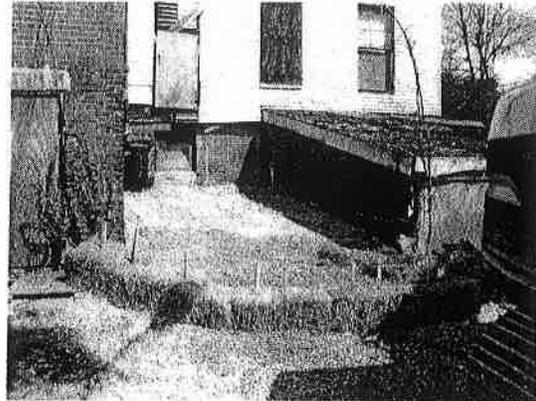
View of the former UST area following backfill and the installation of an erosion control barrier, looking southeast.
